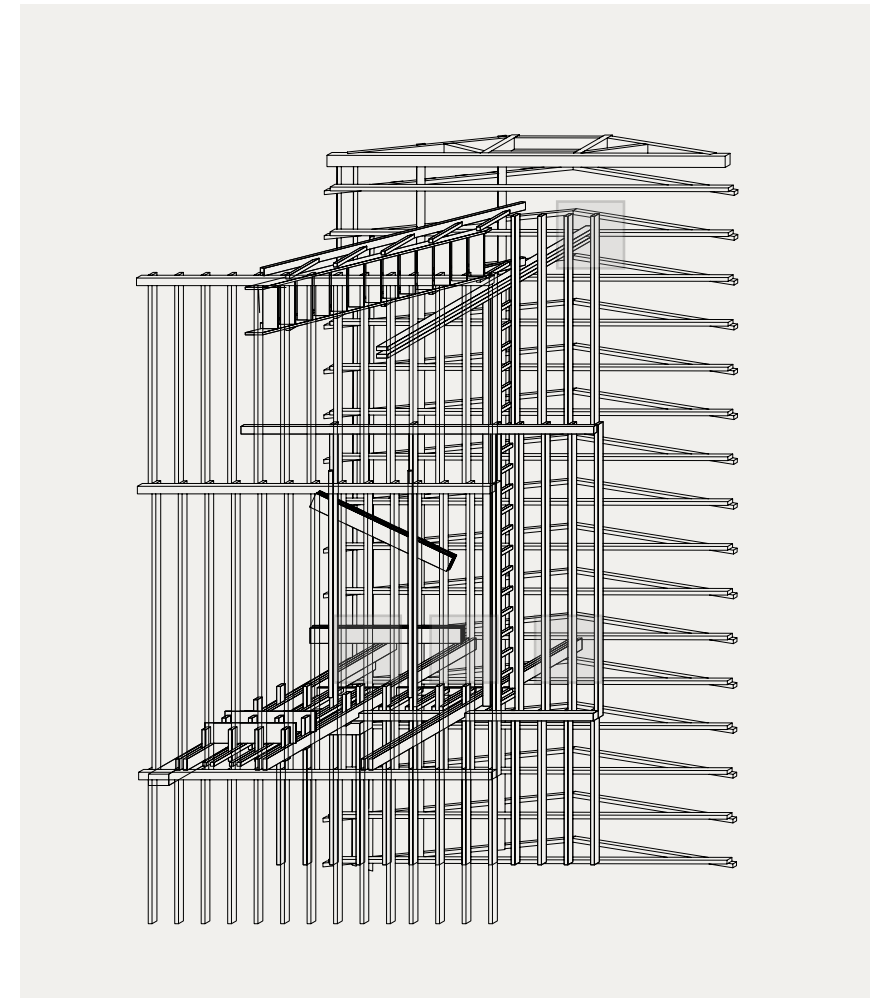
Diagram showing how the balcony beams are connected to the roof rafters - making use of the original building framework. (J. Fisher, 2021).
